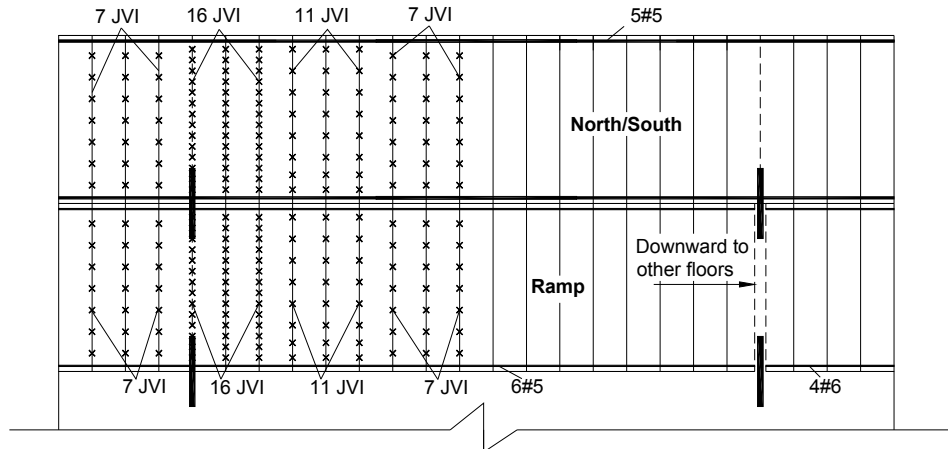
Diaphragm reinforcement at other floors for example 2A.
